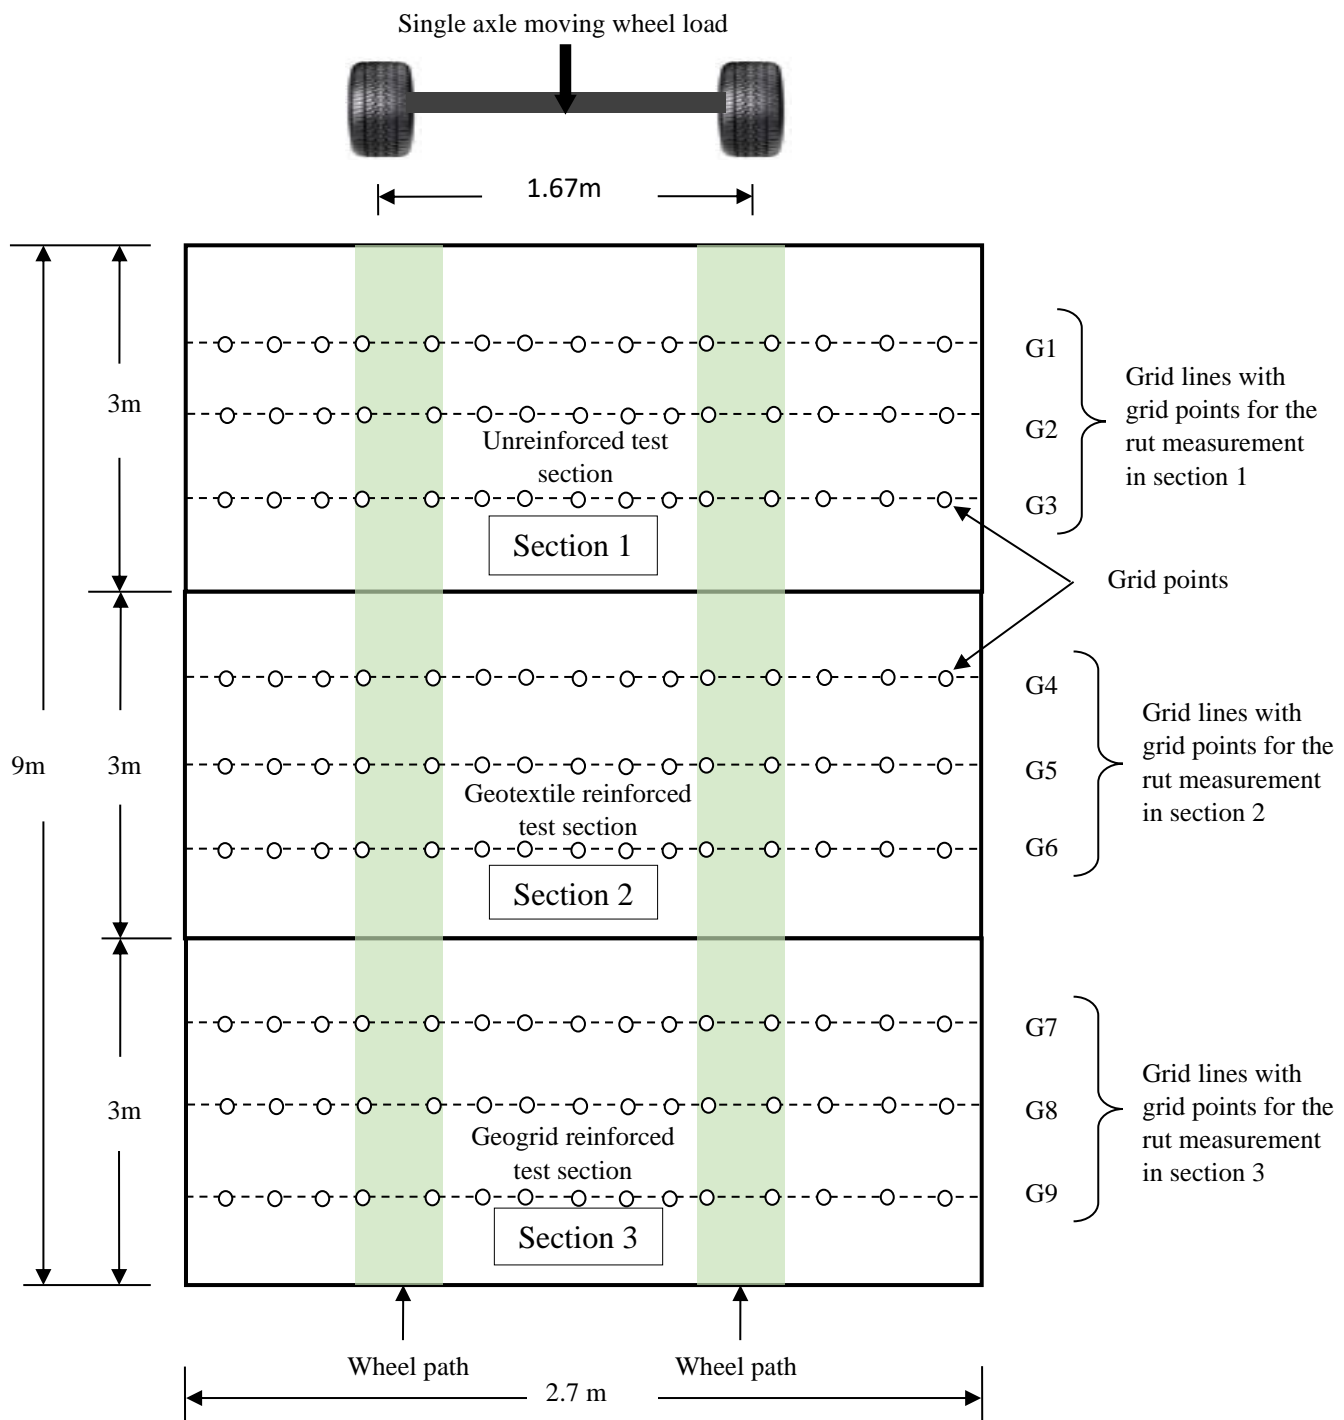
A cross-sectional view of geosynthetic-reinforced unpaved road test section.
